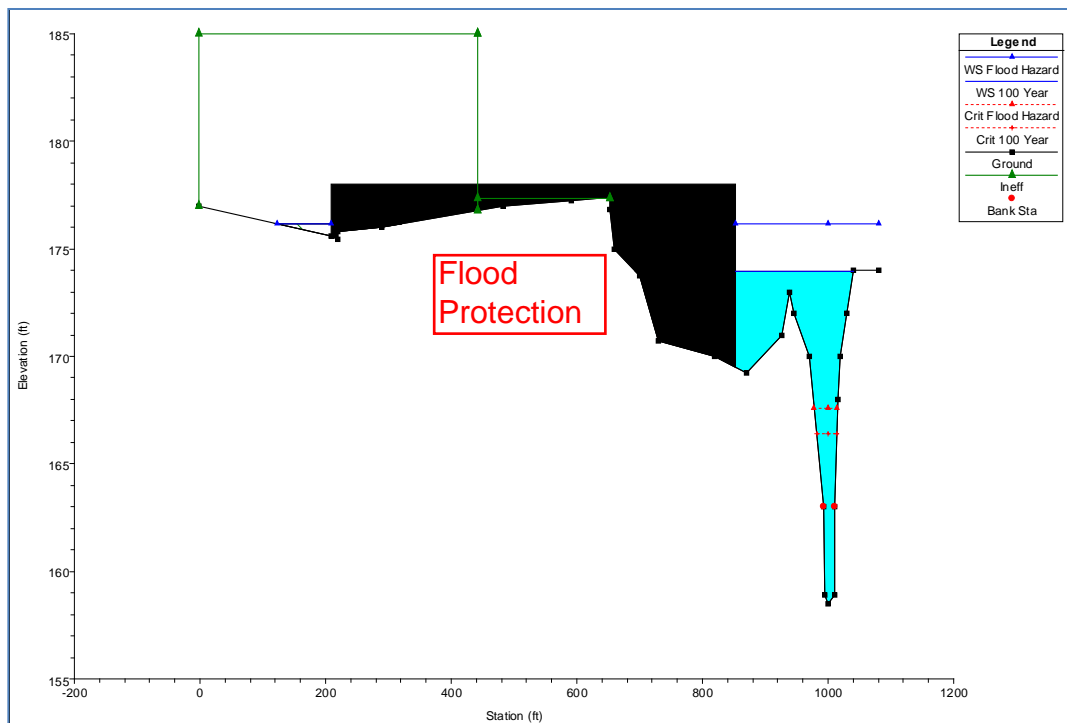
Cross-sectional view upstream of site (XS 2475) and downstream of warehouse looking downstream.
